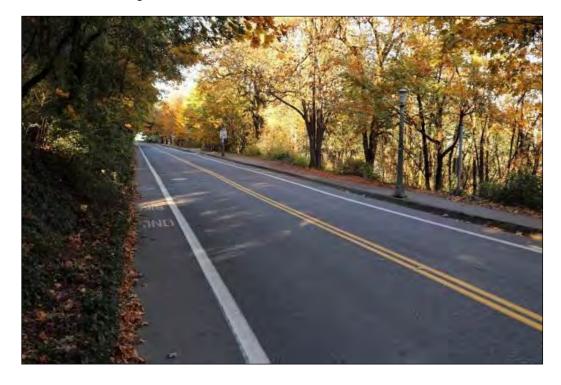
of 21: Terwilliger Parkway's pedestrian path along straight section; view looking to the northeast. Note concrete curbing and curb tight location of the lamp post with the replacement saucer fixtures along the Terwilliger Parkway; it's the location and cadence of the lamp posts that evokes the parkway design.
